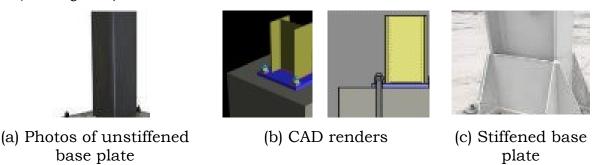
Photos and CAD renderings steel column to concrete base connections
